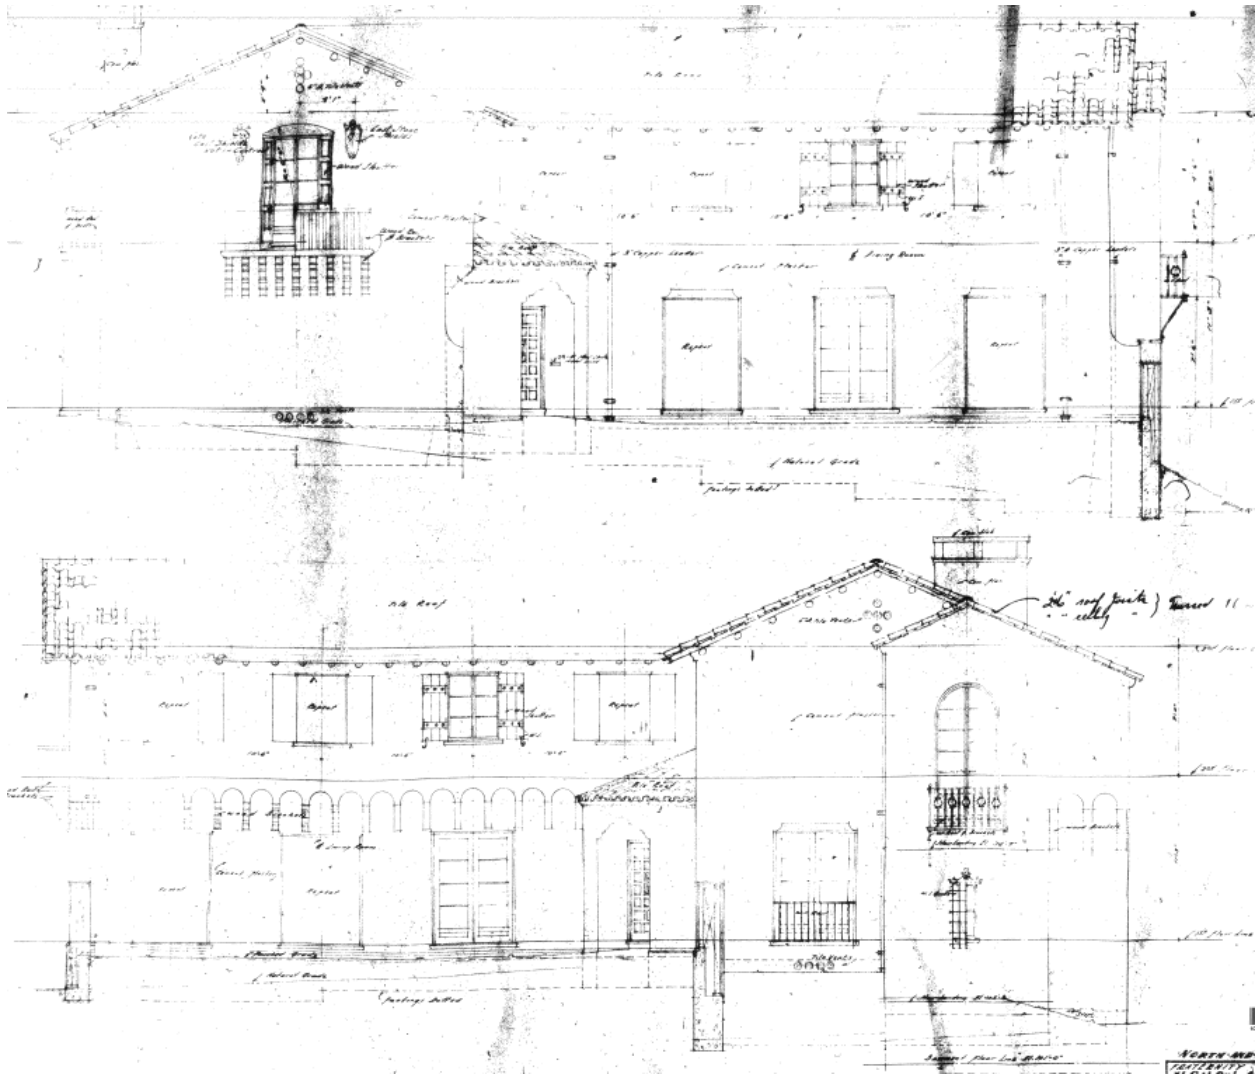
1926 Drawings North (Top) and West (Bottom) Building Elevation
